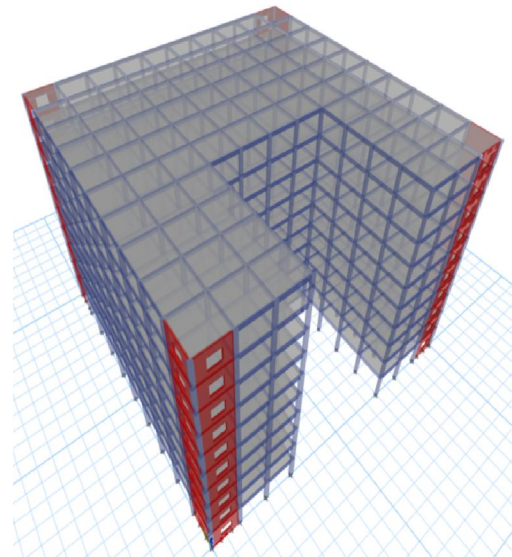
C-Shape Opening in Shear wall (Opening)
